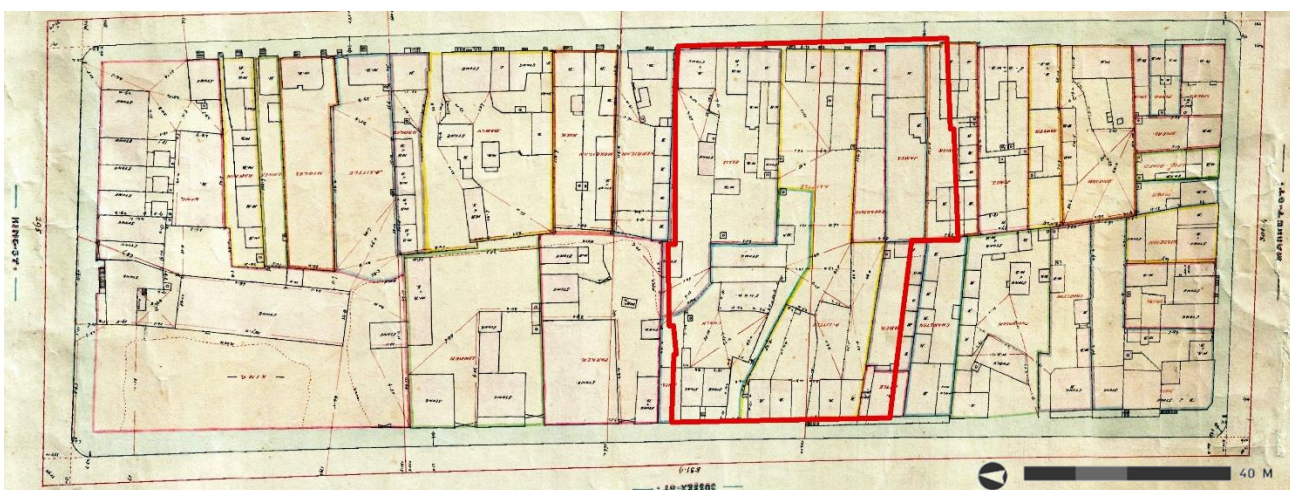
1855 Detail Plan of Section 29, showing the extent of development within the subject site at this time (outlined in red), including service connections to outbuildings.
